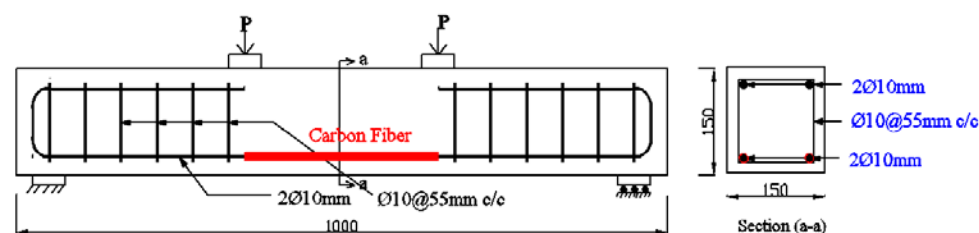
Dimensions and details of the tested beams having reinforcing bars wrapped by CFRB in the maximum moment zone at a length of (300mm)
